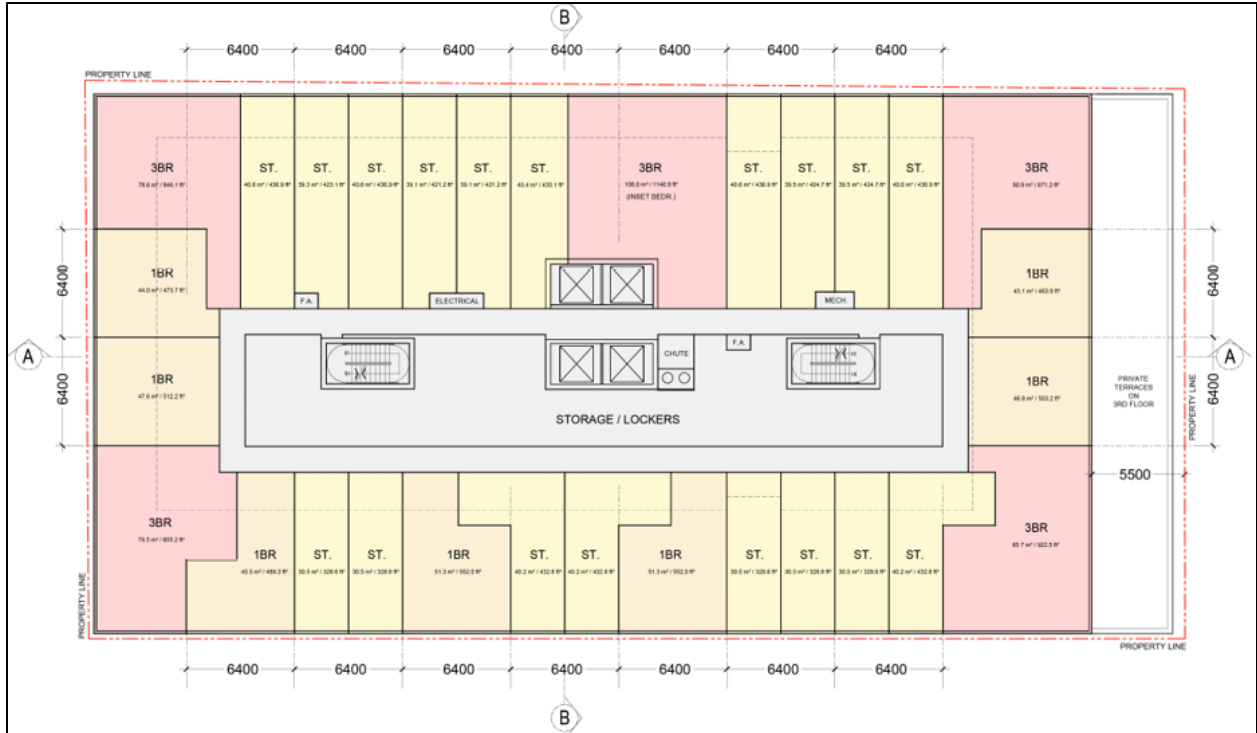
3rd and 4th Floor Plan (Source: Hariri Pontarini Architects)
